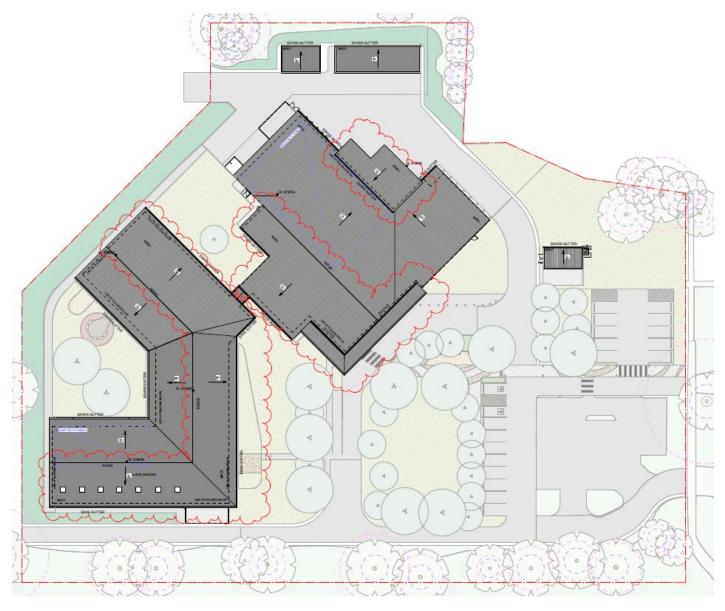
Overall Roof Plan showing the Proposed Amended site layout
